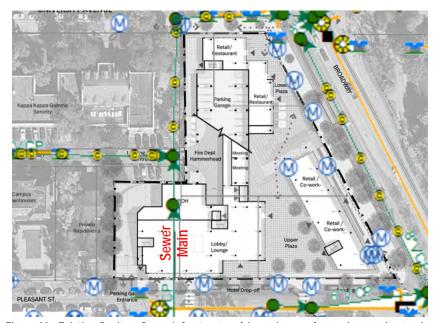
Existing Sanitary Sewer Infrastructure (shown in green) superimposed onto plan
